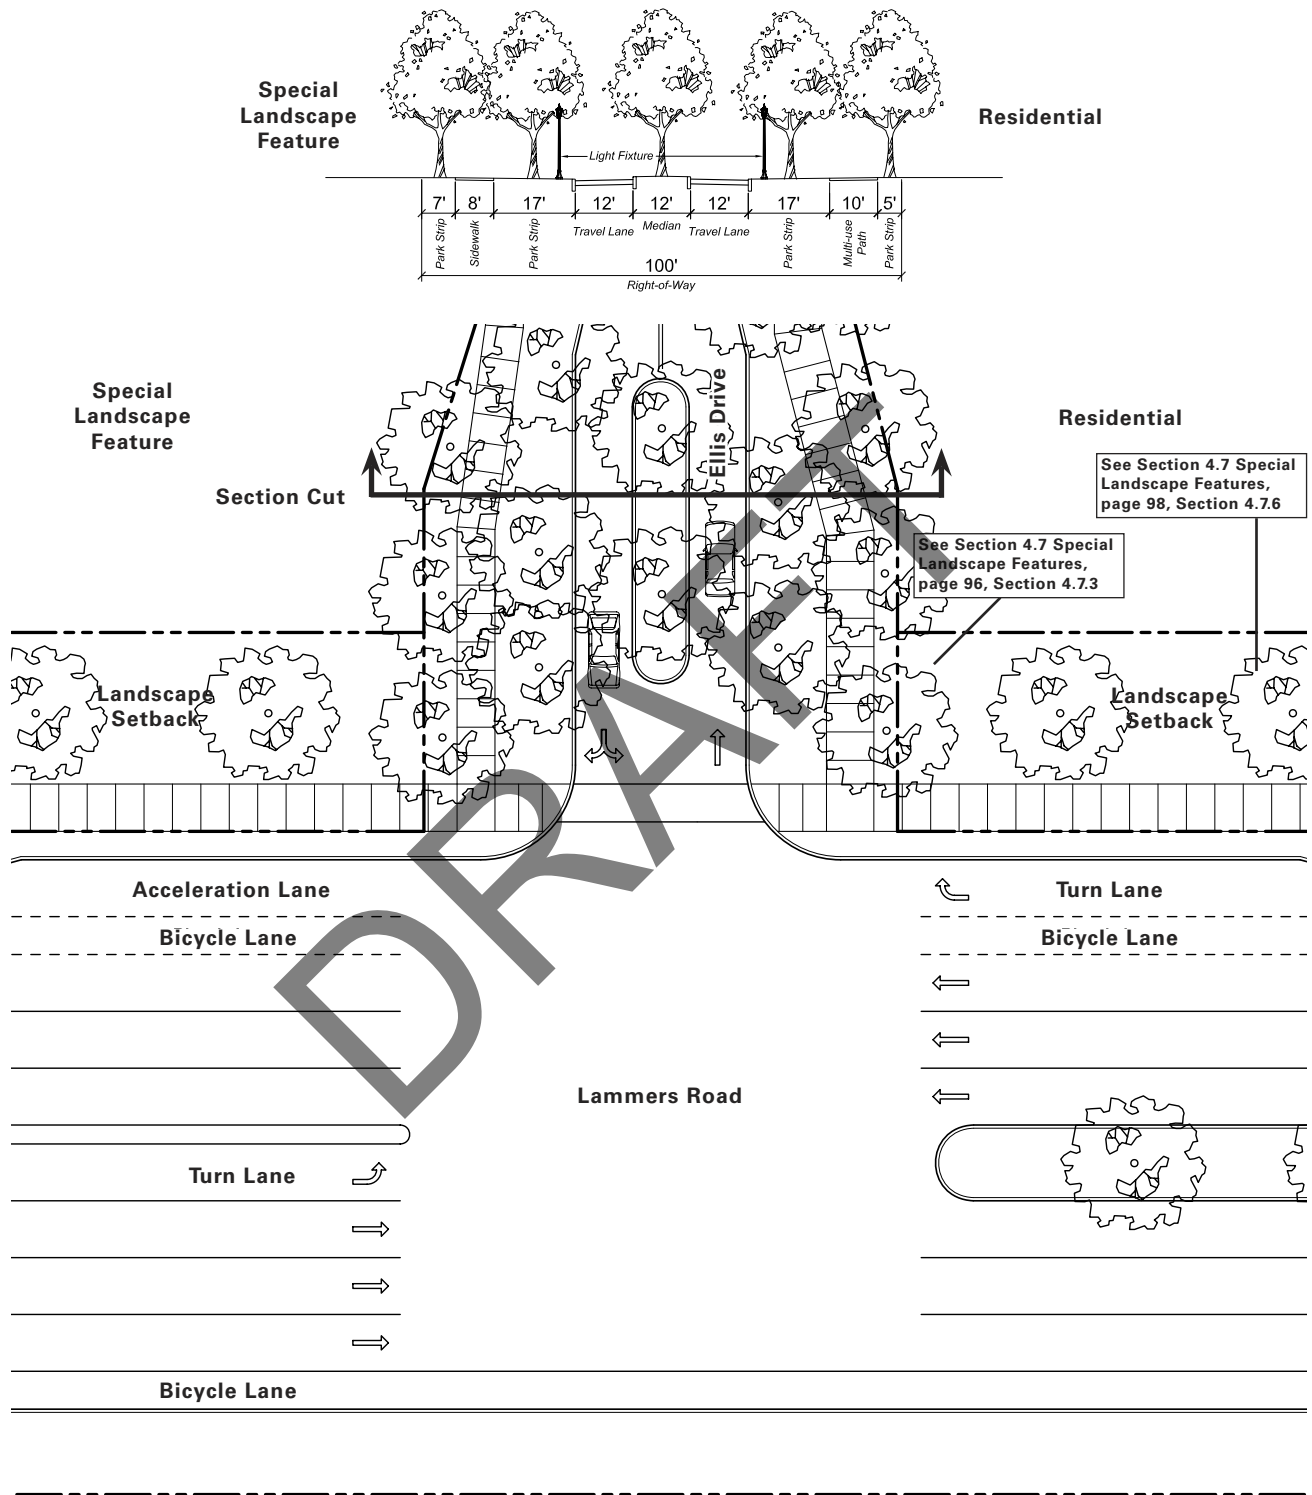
Proposed Section and Plan: Entry Street A
